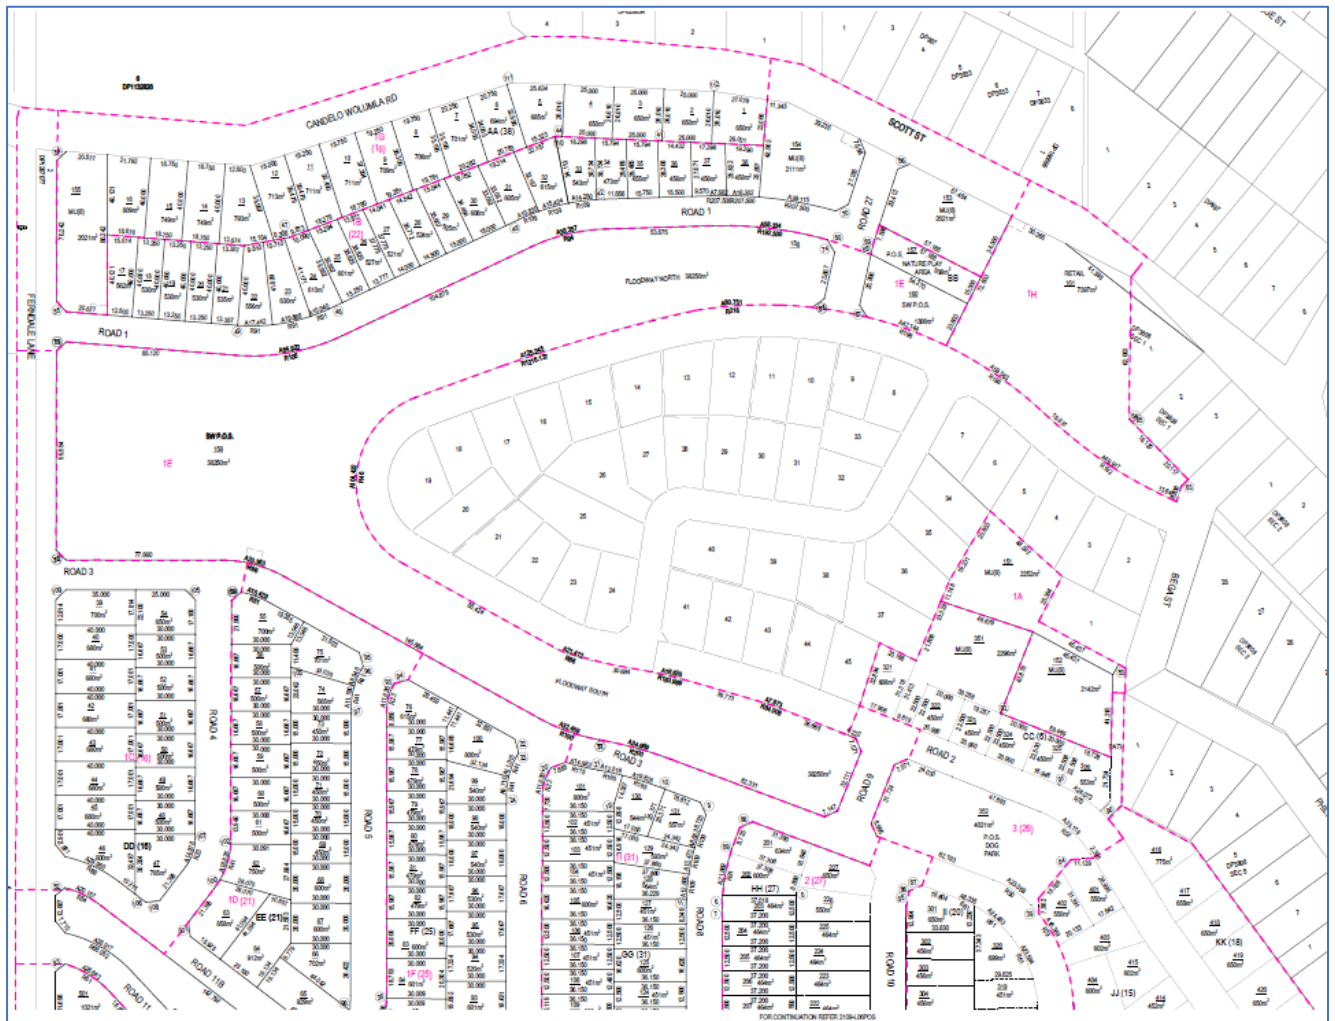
Stage 1 Proposed Plan of Subdivision - Sheet 1
